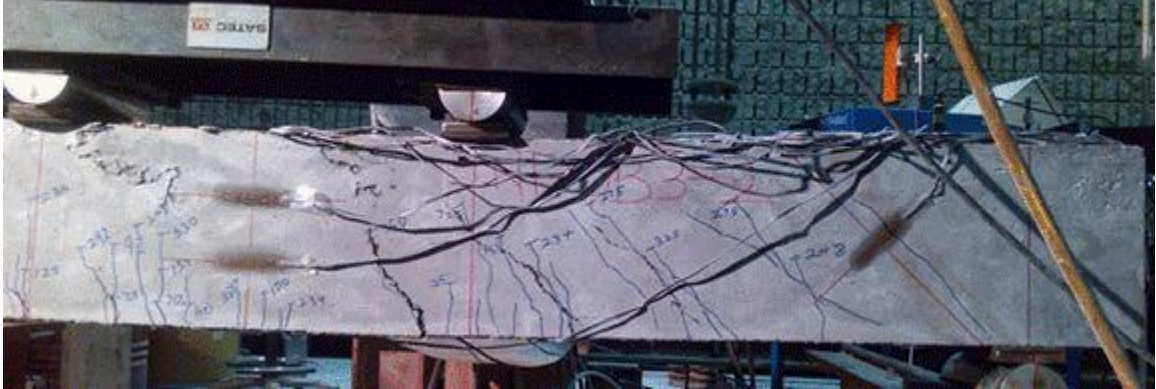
Unloaded post-failure deformed configuration of SB-2.4-UMSN, showing extensive damages.
